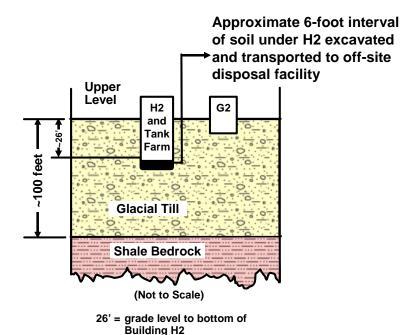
Cross-section Illustrating Assumed Excavation for Alternative UL-2
